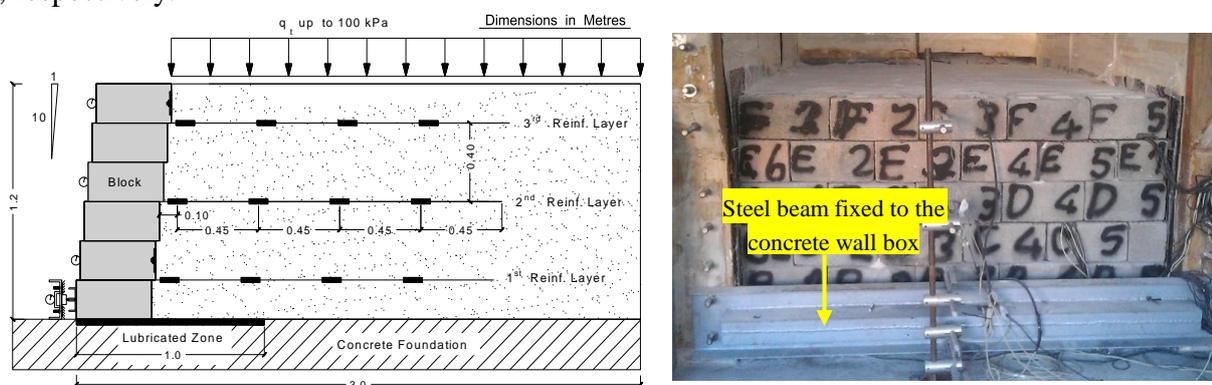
A cross-sectional view of a block-face wall and a front view of Wall 1 at the end of construction.
